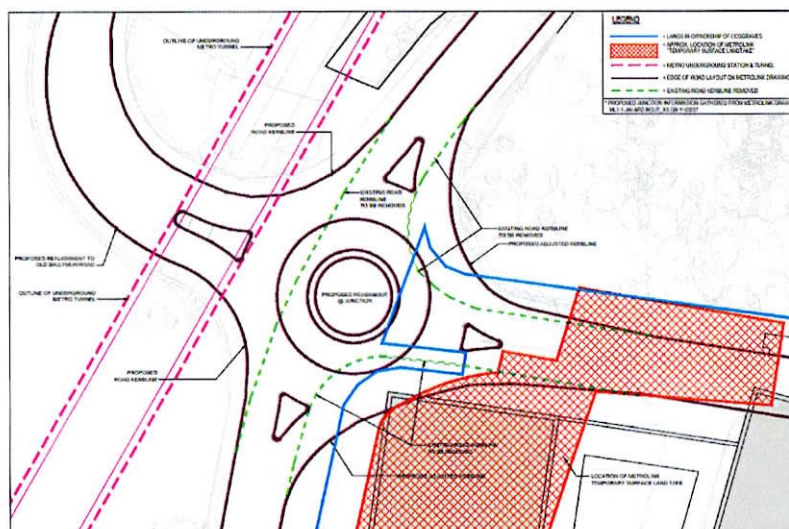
Overlay of the proposed new permanent roundabout on the subject site
